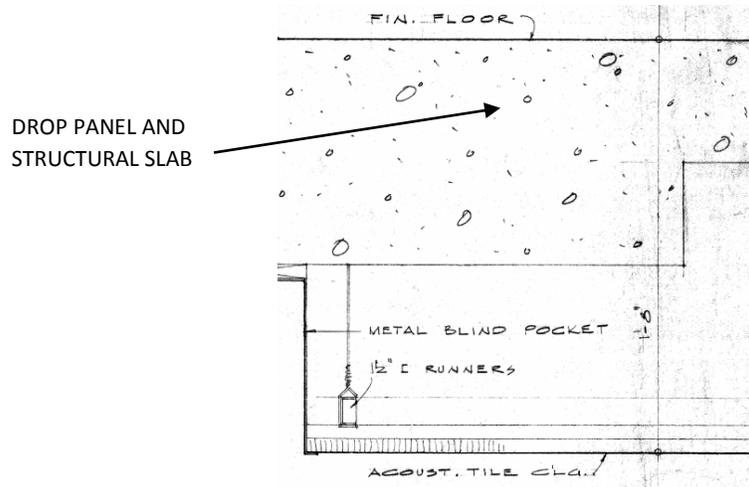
Section through typical floor in existing building. From A.12: Window & Wall Sections
